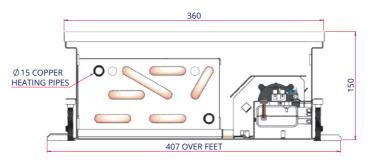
shows the various cross-sectional dimensions of the standard trench units. When installing in a concrete floor the minimum clearances should be observed; 20mm on either side and at both ends is recommended but this will need to be increased if pipework and/or electrical conduit is to be run alongside the trench. Note that the width at the feet not the unit width needs to be considered when sizing the trench.
